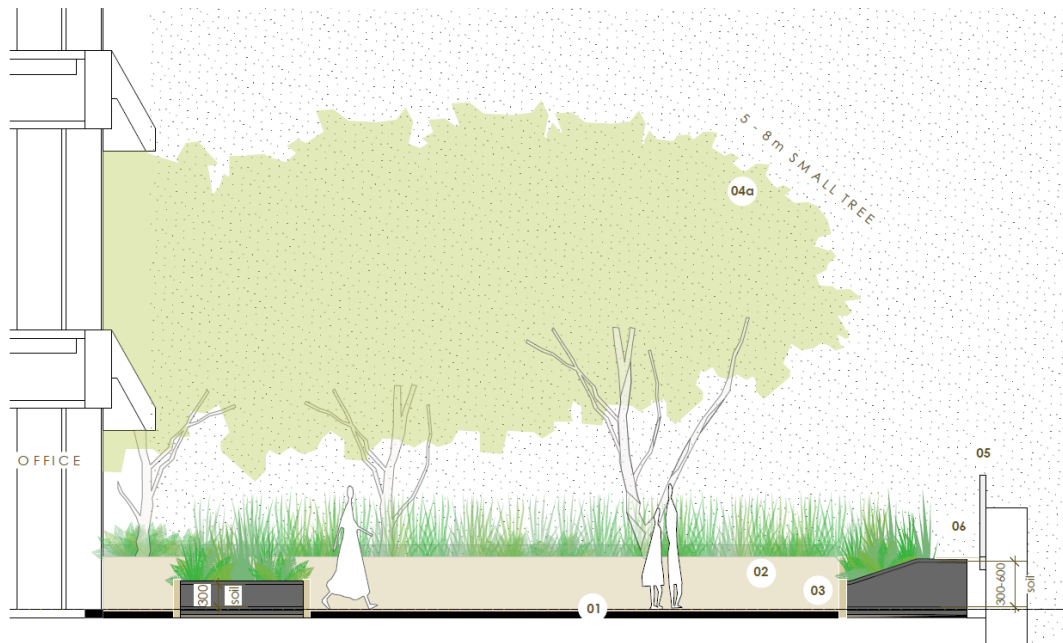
Illustration of the Balustrade, Planter and Tree Heights in the Proposed Landscape Plan
